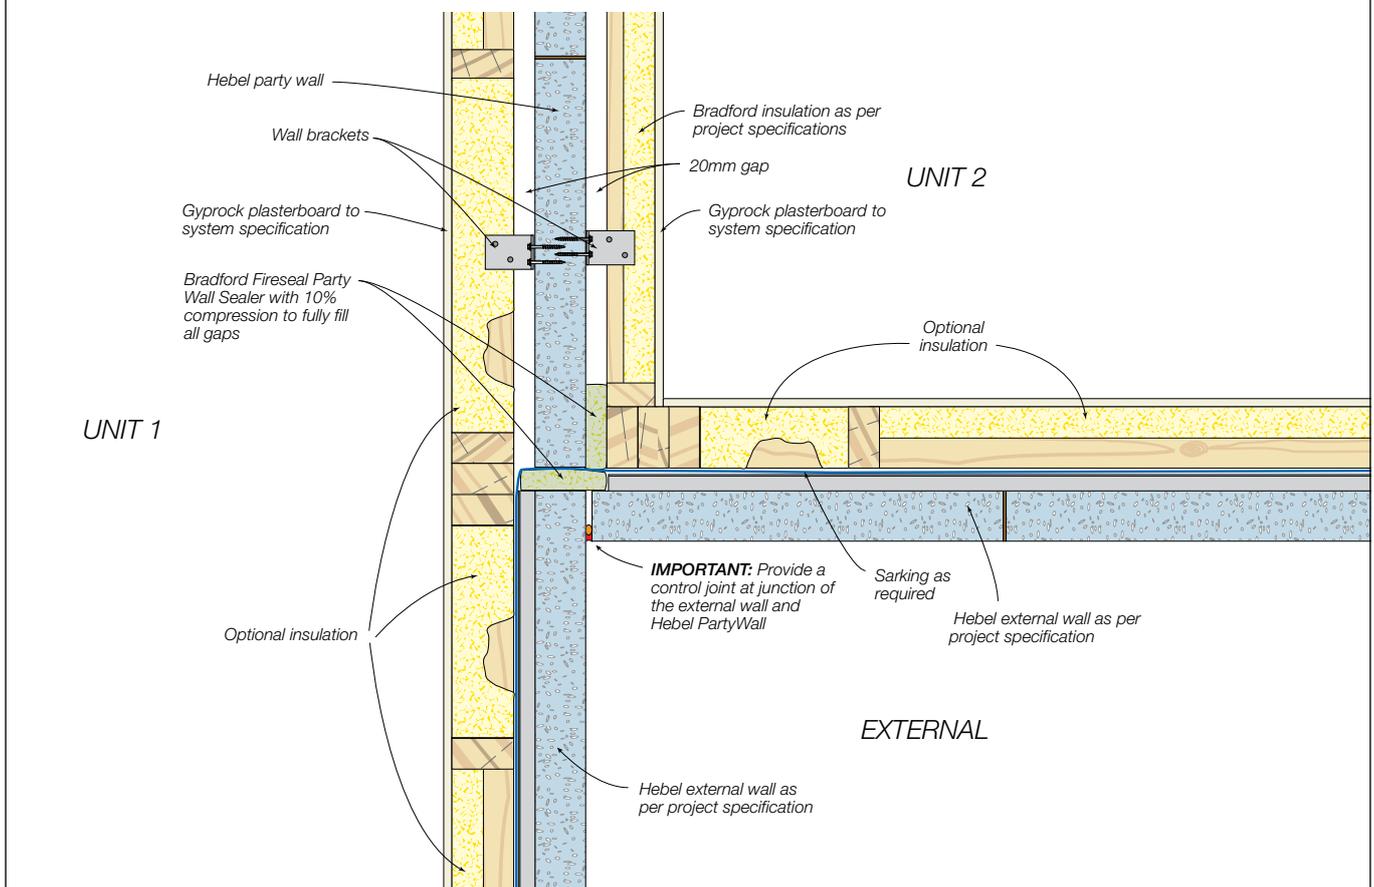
External wall corner junction for PowerPanel^{XL} Intertency Wall System
